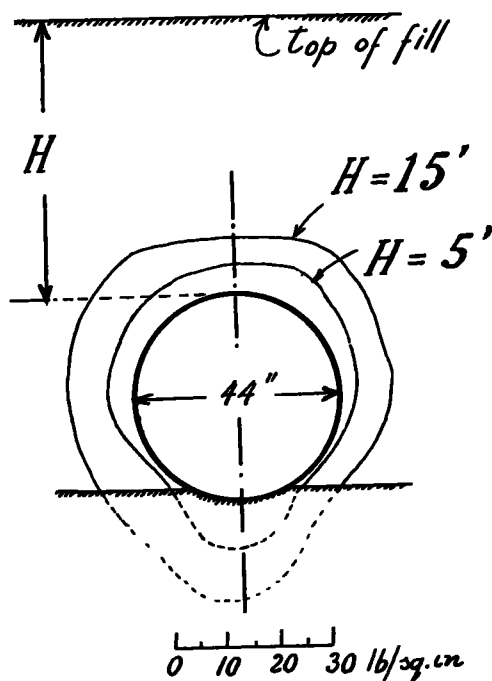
Radial Pressures on Corrugated Iron Pipe Culvert (Bull. 96, Iowa State College)
